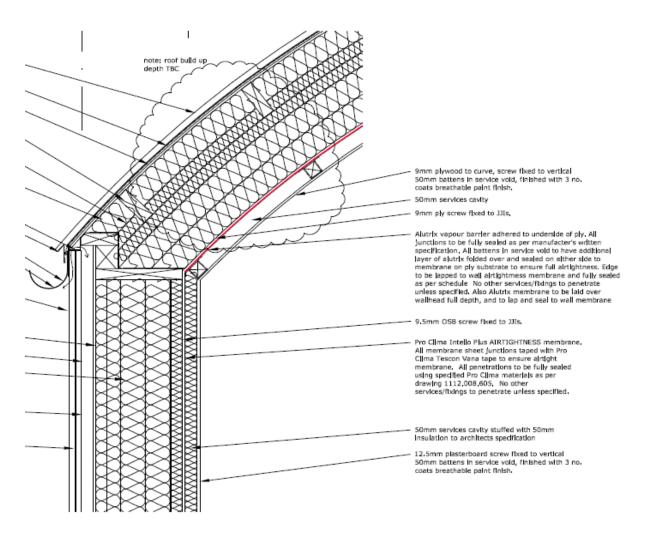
Base case construction external wall and roof build-ups showing insulation (Kirsty MaGuire Architects, 2012)
